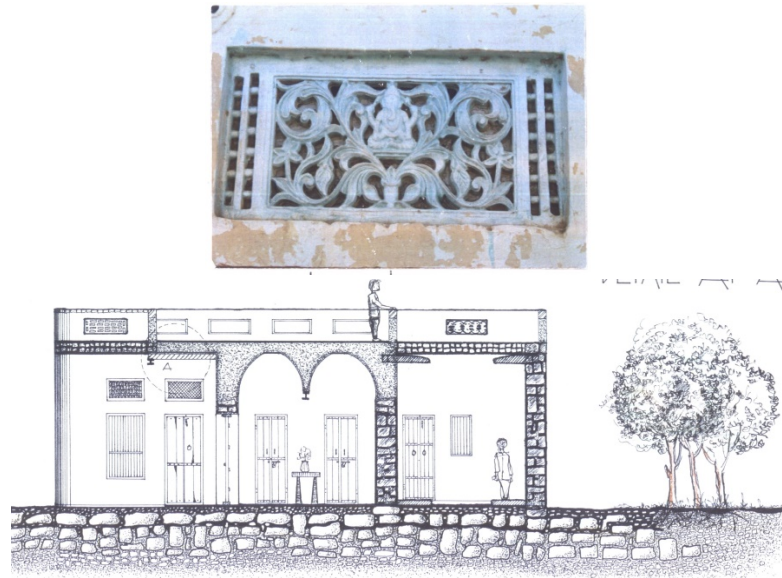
Roof Section and Jali image (Drawing by Author-Studio work)
